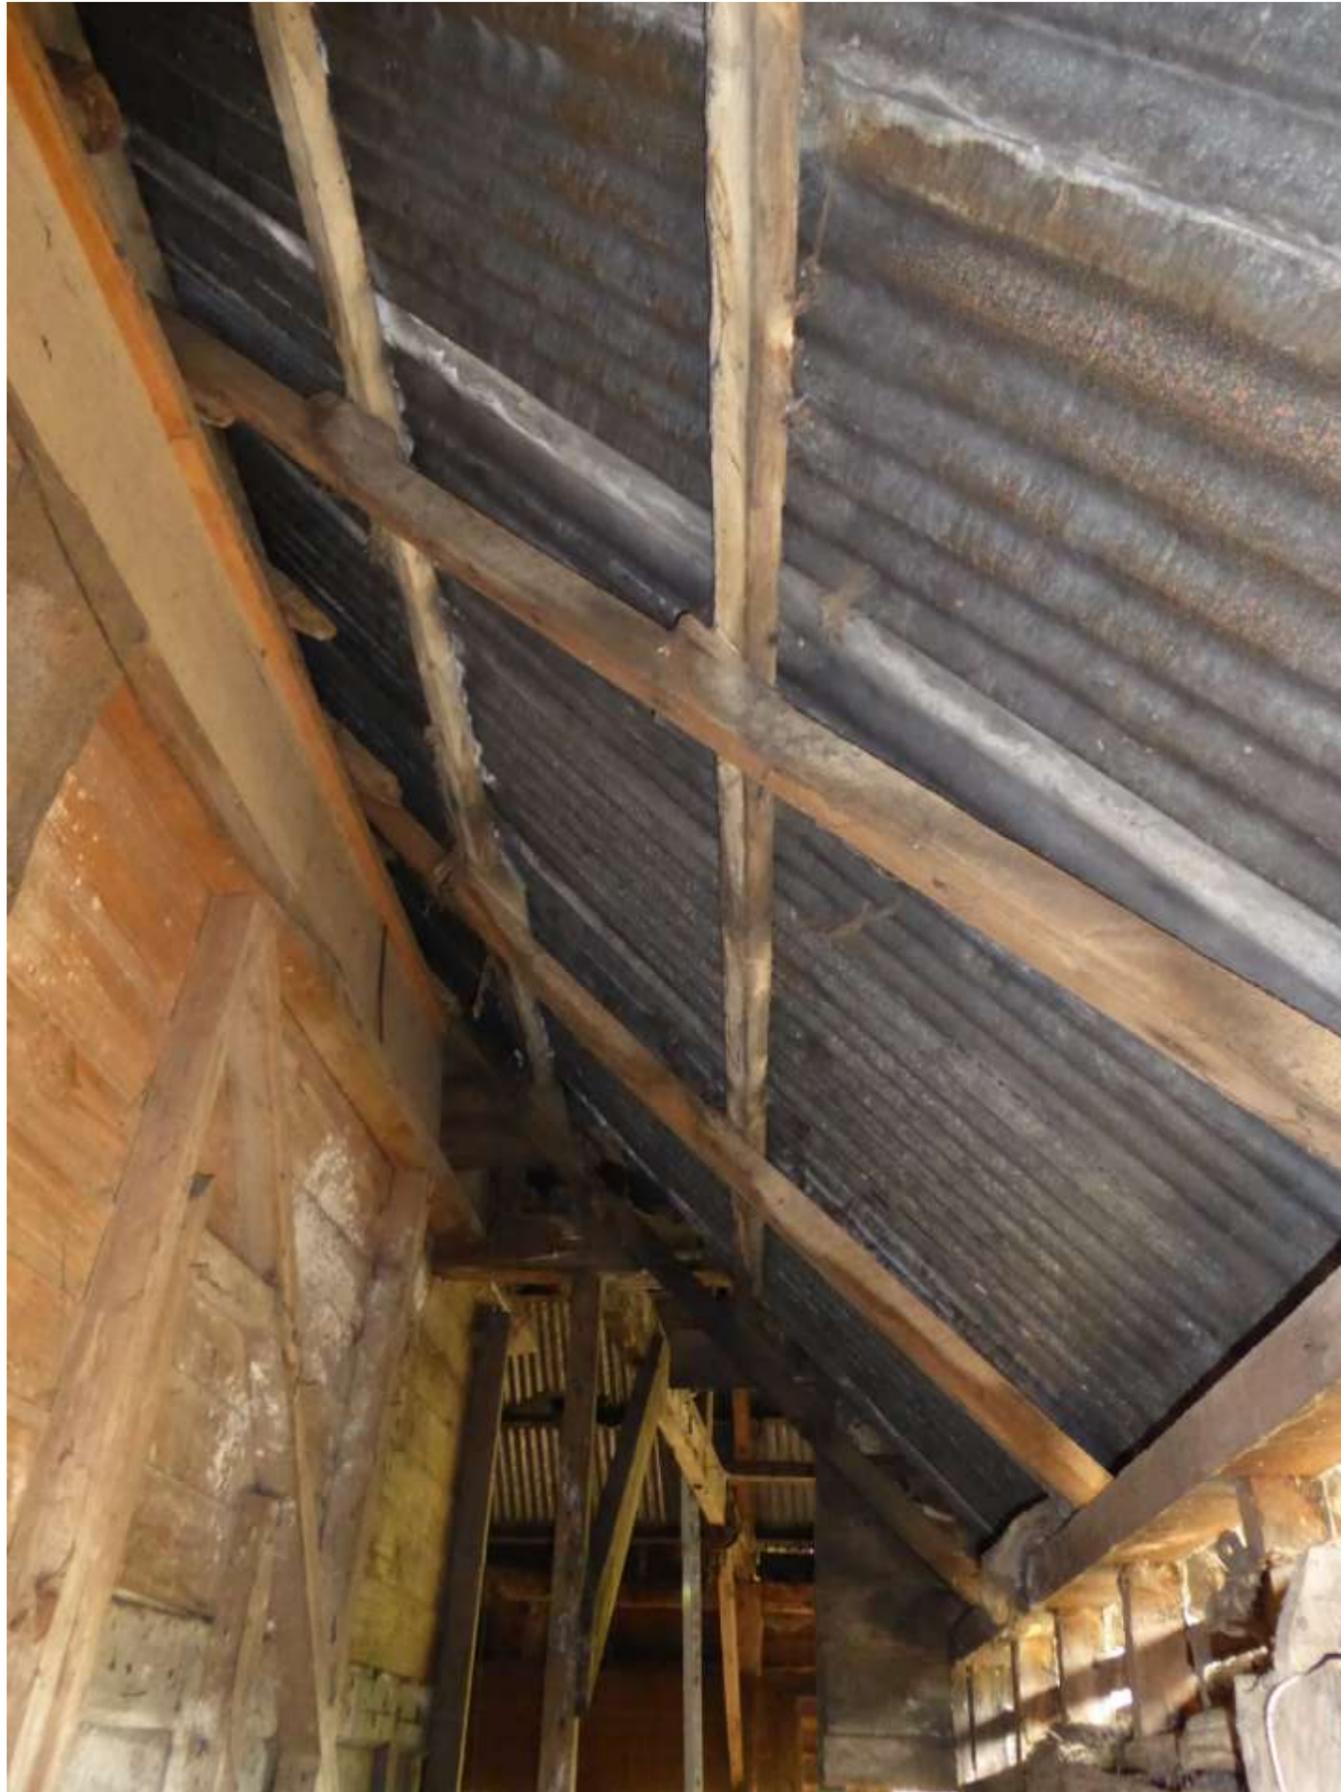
The roof structure (looking north) of the eastern room with catslide roof.
